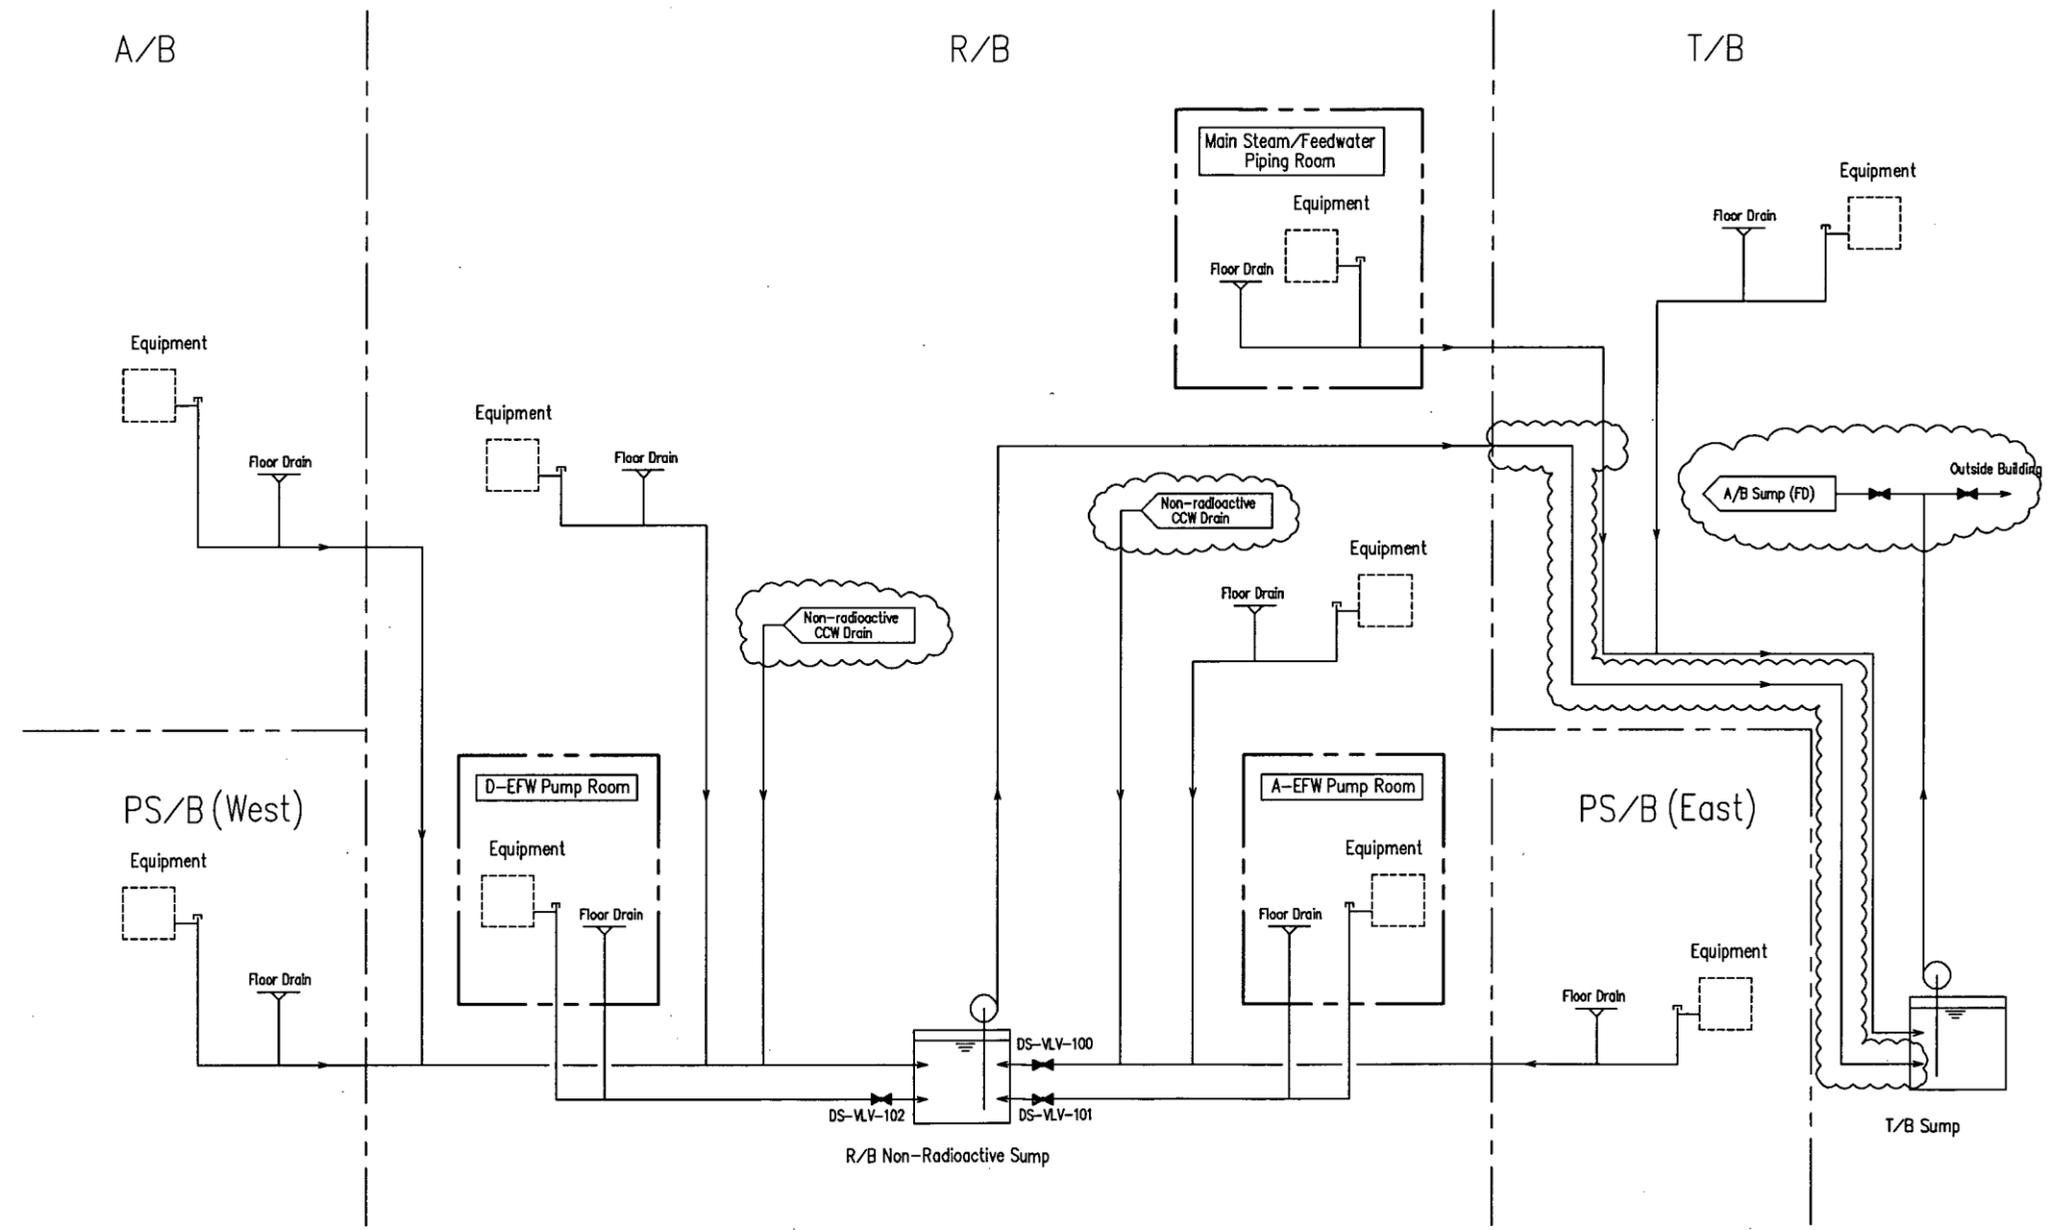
Equipment and Floor Drain System Flow Schematic (Sheet 2 of 2)
